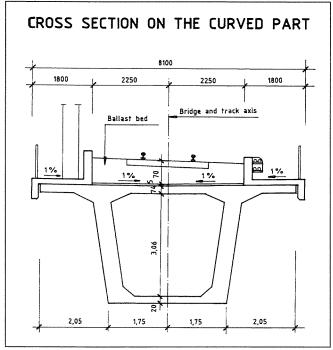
Transverse section of prestressed concrete bridge elaborated in the tender plan
